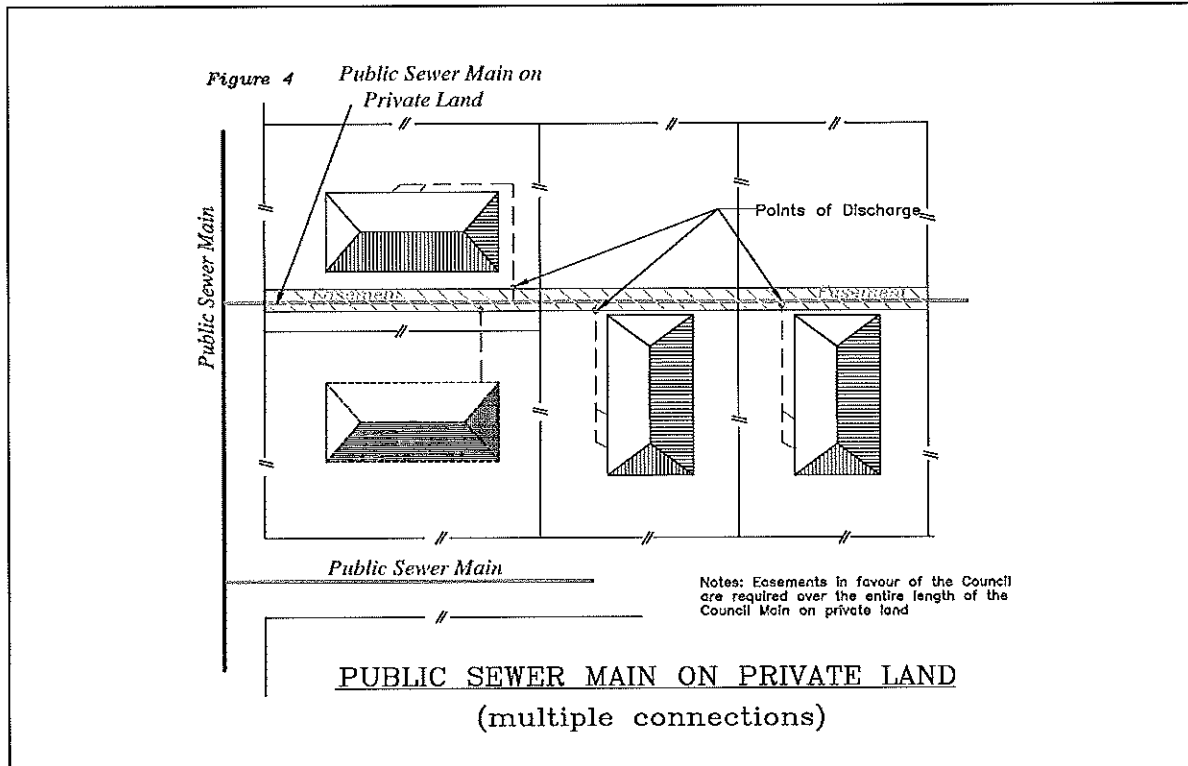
Typical layout at point of discharge – Public sewer main on private land – Easement required.
